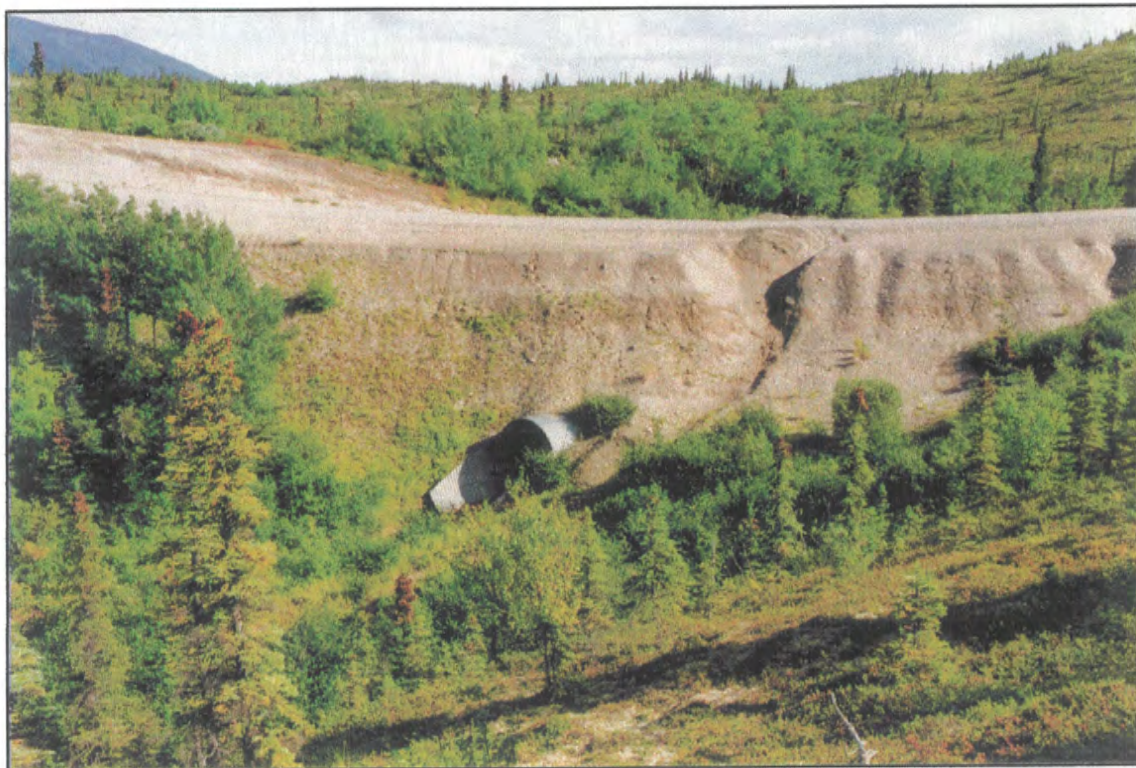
Eroded road embankment at S. Fork Alexcy Creek. Looking at the outlet culvert. 8-24-99.
